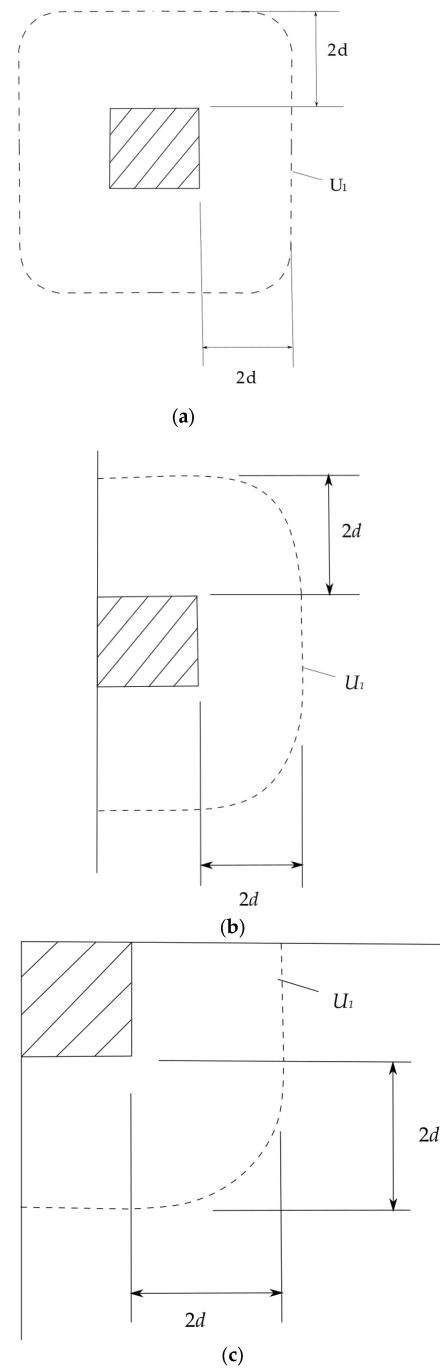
Basic control perimeter for an interior, edge and corner slab–column connection, modified from Ref. [8]: (a) interior slab–column connection; (b) edge slab–column connection; (c) corner slab–column connection.
